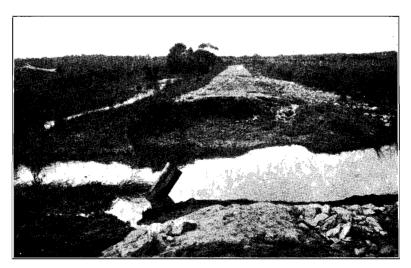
A.—Showing damage on McCraw's Road, Korumburra Shire.
